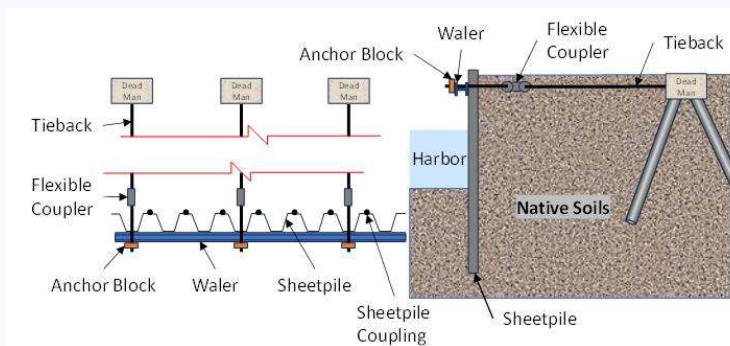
Examples of Embedded Sheet Retaining Wall Systems
